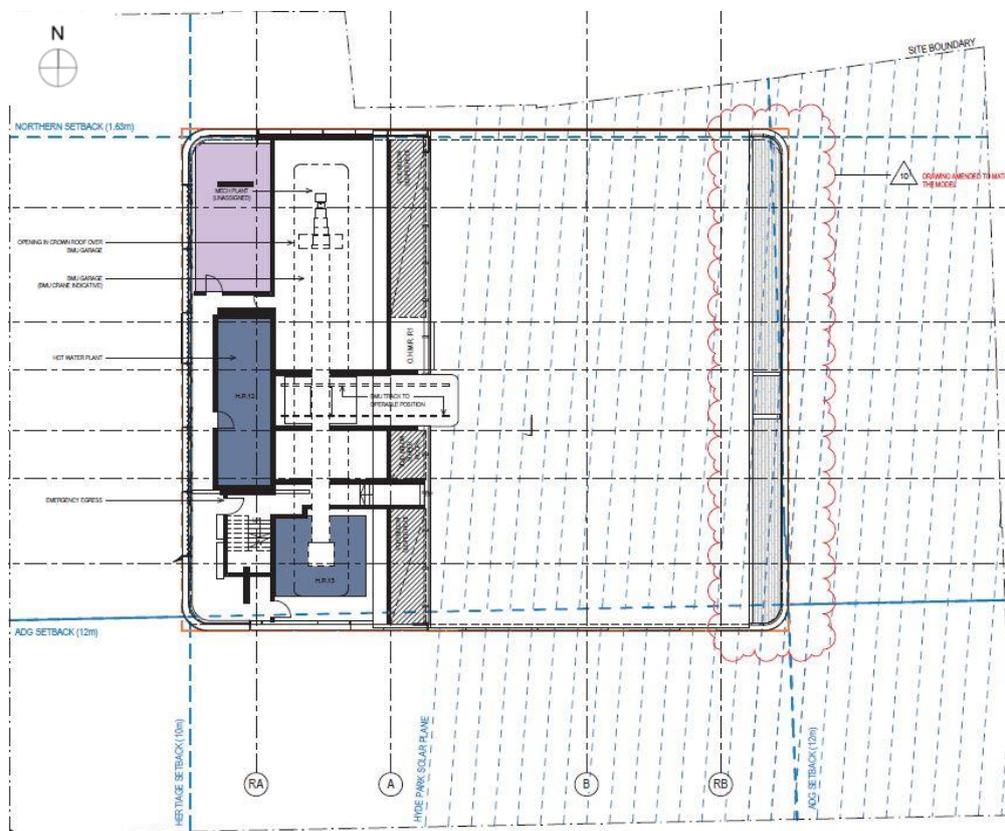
Typical rooftop plant plan (level 48 shown, including BMU garage)
